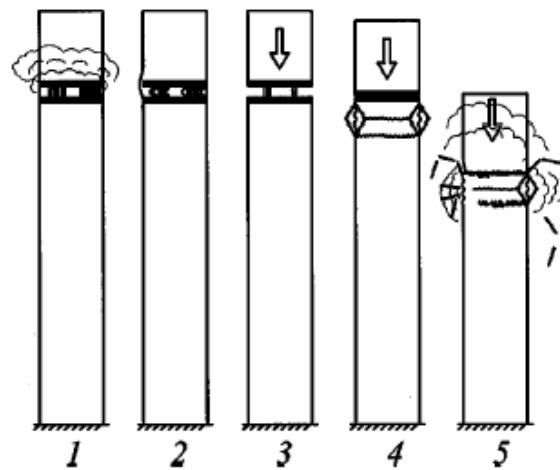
Connection of wall and floor slabs (Pearson and Delatte 2005)
